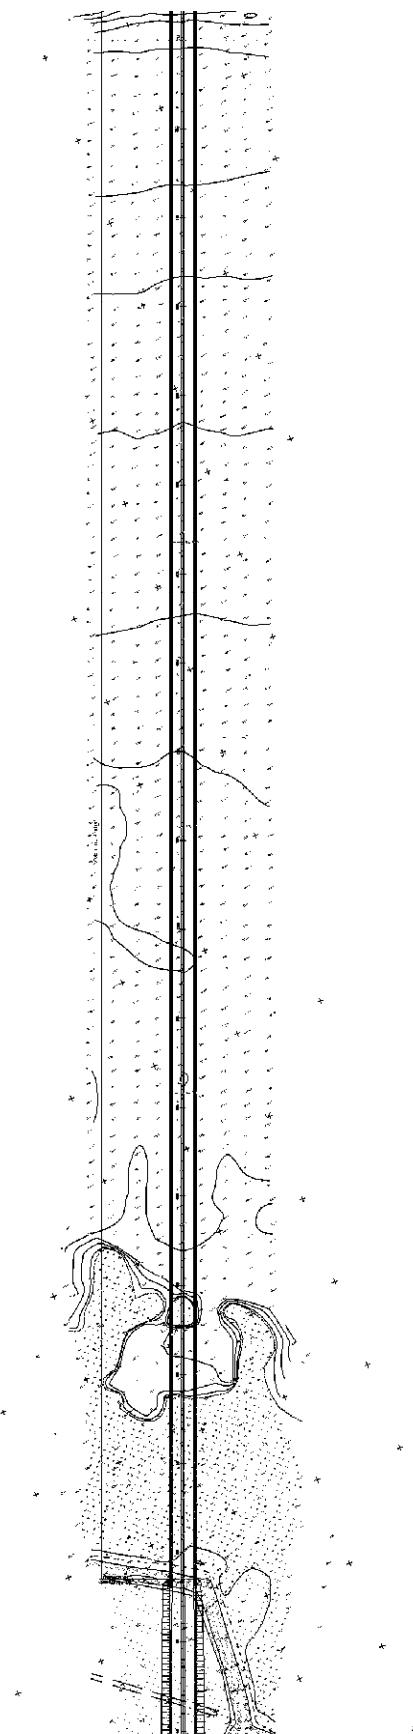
Plan of M-14 Bypass Road (2)
